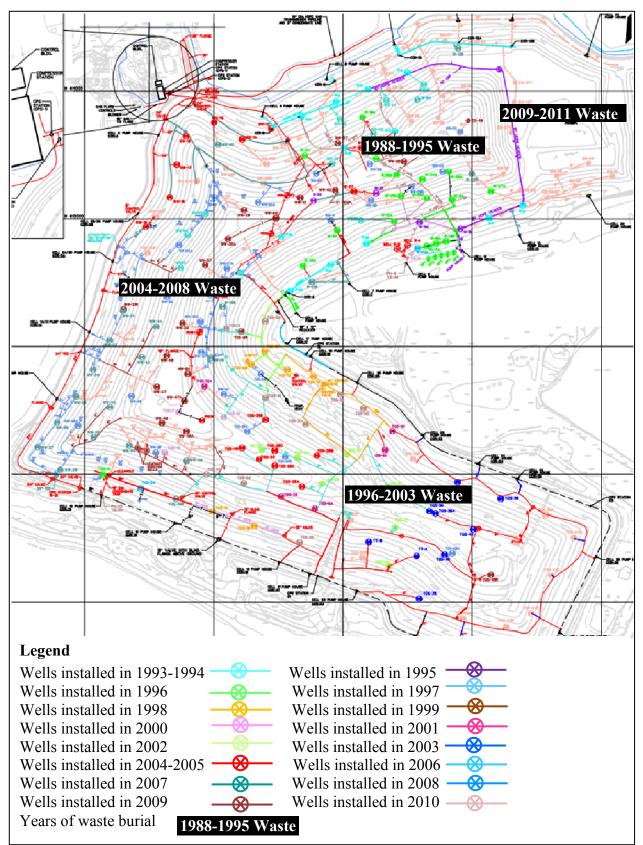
Location of waste disposal and schedule of final cover and GCCS installation at Landfill T.
